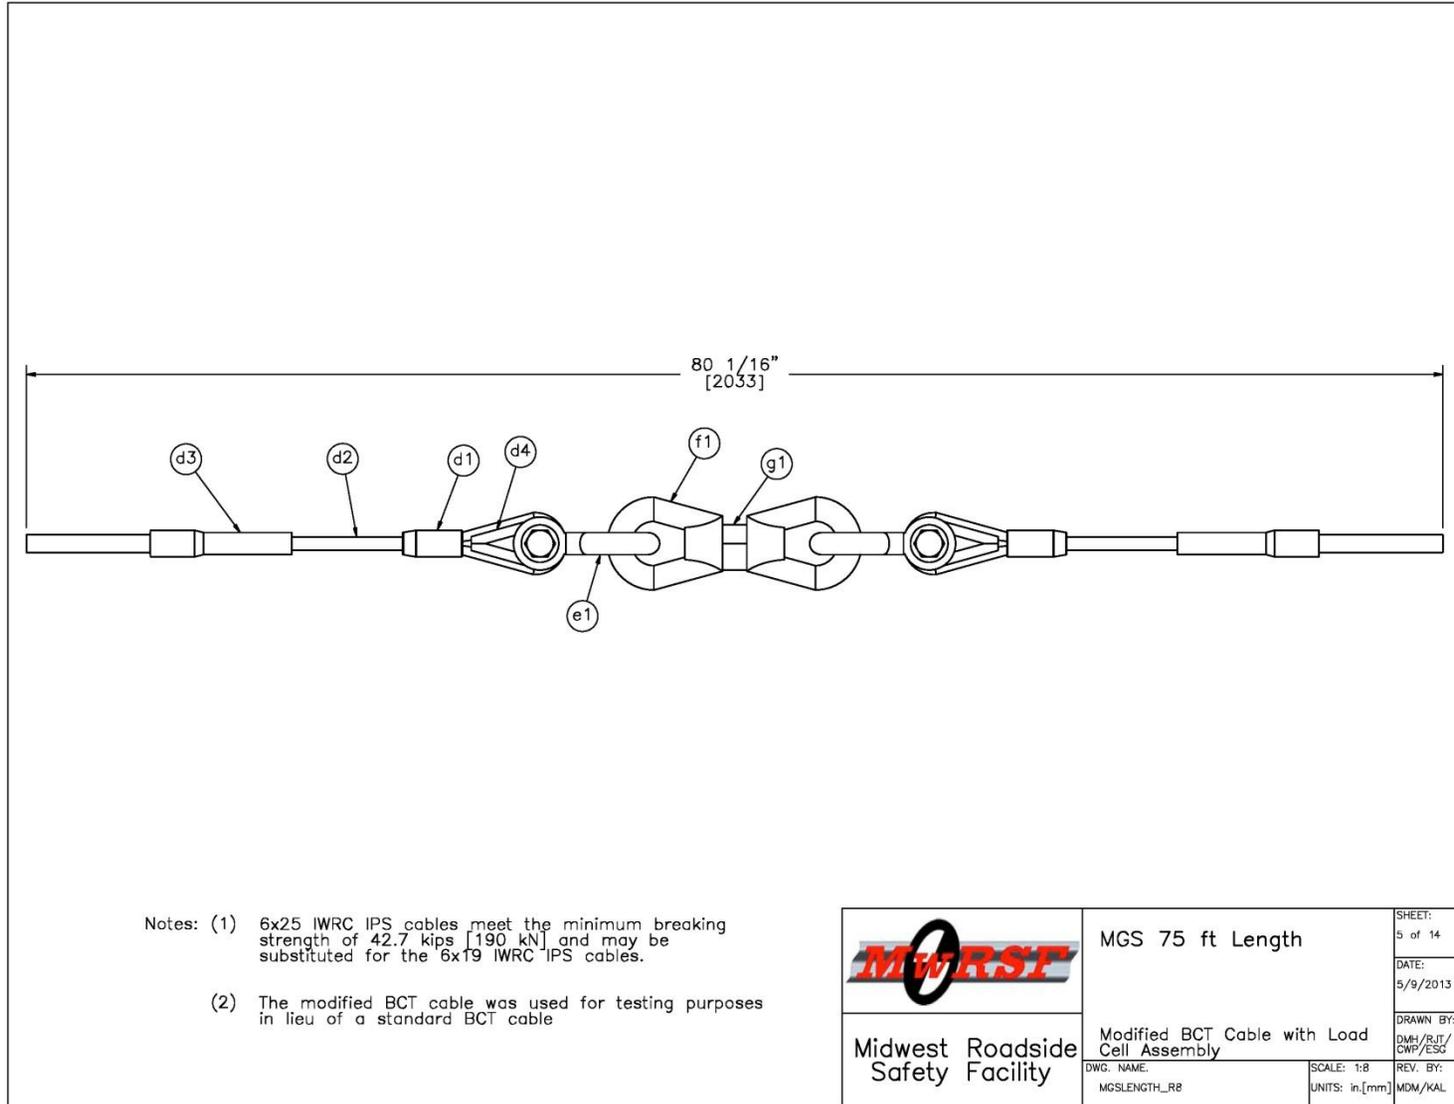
Modified BCT Cable with Load Cell Details, Test No. MGSMIN-1
